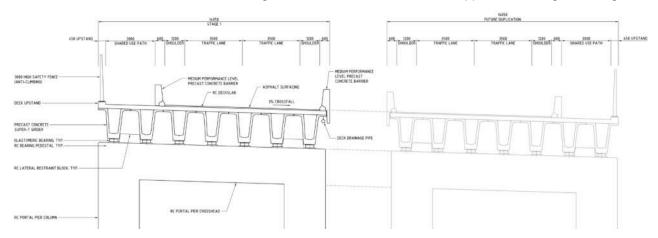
Concept Bridge cross section showing interim and ultimate configurations
